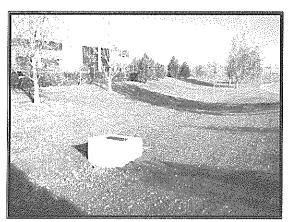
Detention pond with safe outlet, placed in middle of pond, with mild side slopes and good visibility from office building.
